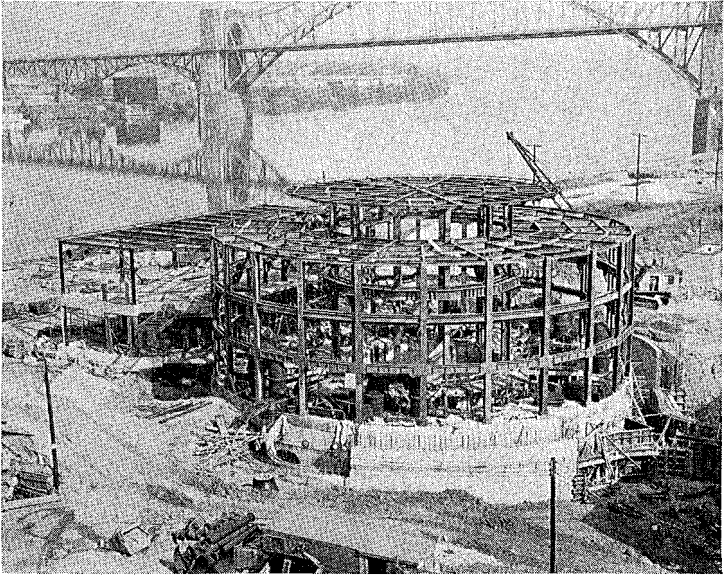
STRUCTURAL STEEL FOR MAIN SEWAGE PUMPING STATION IN PLACE, CONTROL BUILDING PORTION TO THE LEFT WITH CIRCULAR WET AND DRY WELLS ON THE RIGHT, CONCRETE WORK IN THE LOWER RIGHT FOR DISCHARGE CONDUIT TO REMAINDER OF PLANT. MCKEES ROCKS BRIDGE ACROSS OHIO RIVER IN BACKGROUND.
